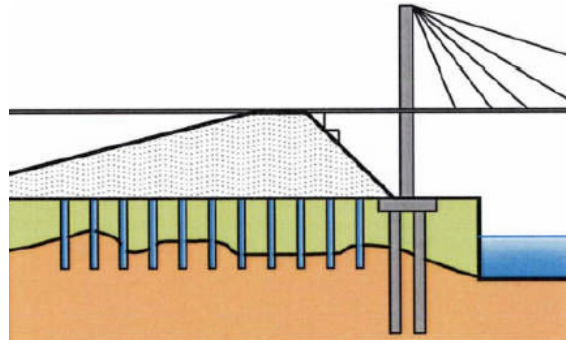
Piled bridge abutment with piled embankment approach (ASIRI, 2012)
